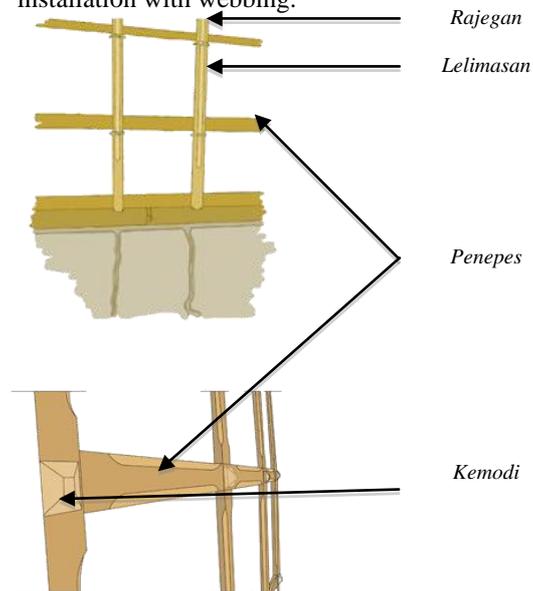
Bamboo Wall Frame (top) and Wooden Wall Frame (bottom)
